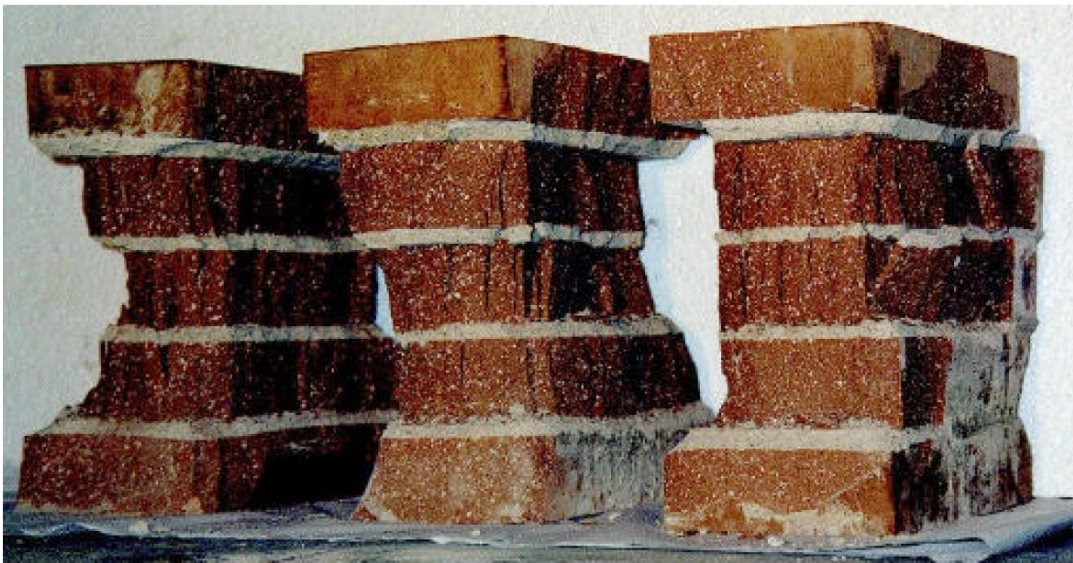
Failure modes of the three tested brick masonry prisms.
